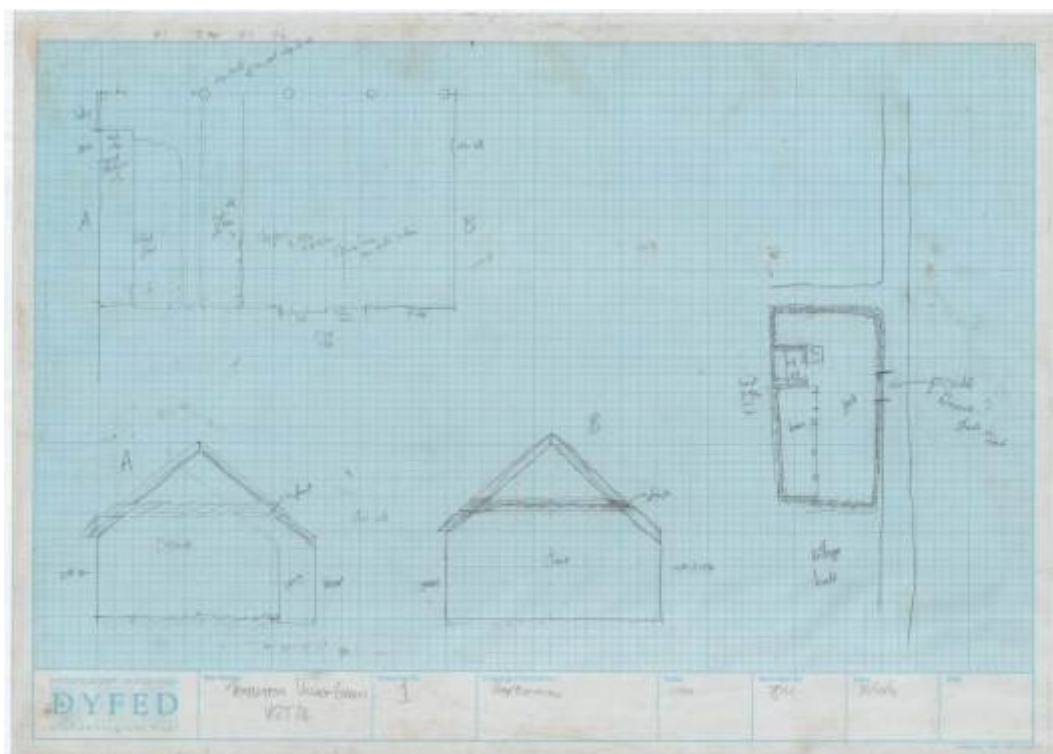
Elevations, floor plan and sketch layout plan of former barn
